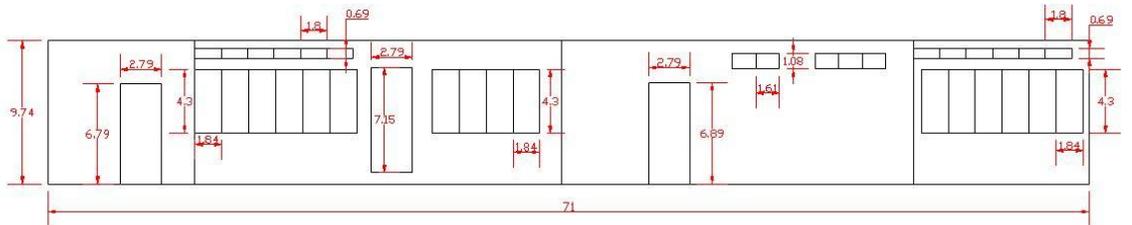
Side 4 of the building, facing South West drawing details dimensions in feet
